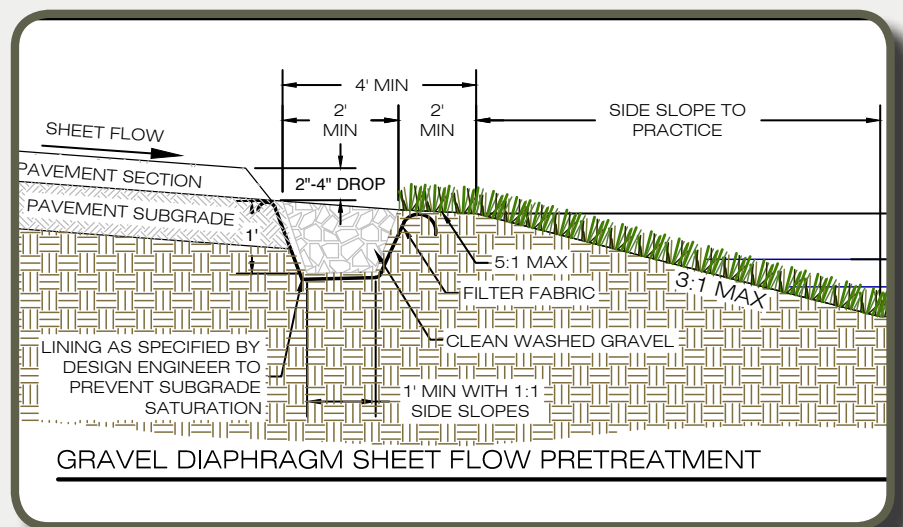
Typical Detail for Pre-Treatment at Pavement Edge – A 2 to 4 inch drop from the pavement to the top of stone helps to prevent clogging.
